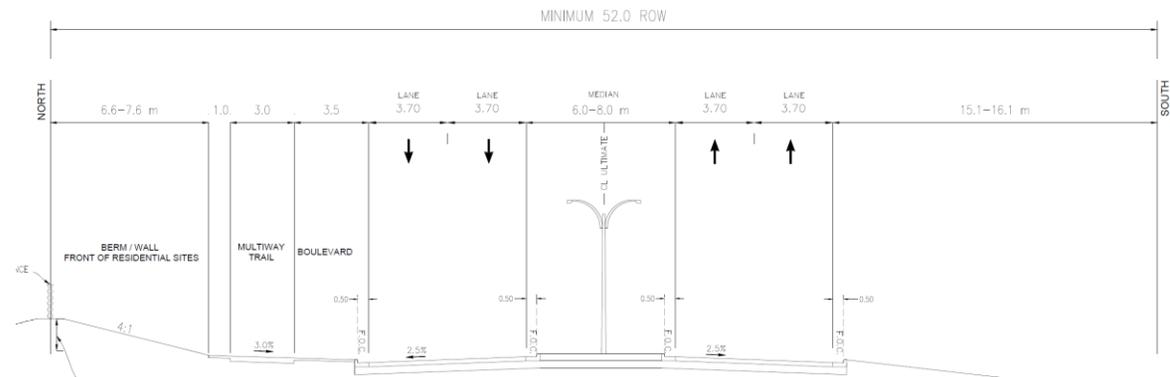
South East Boundary Road Proposed Cross-Section
